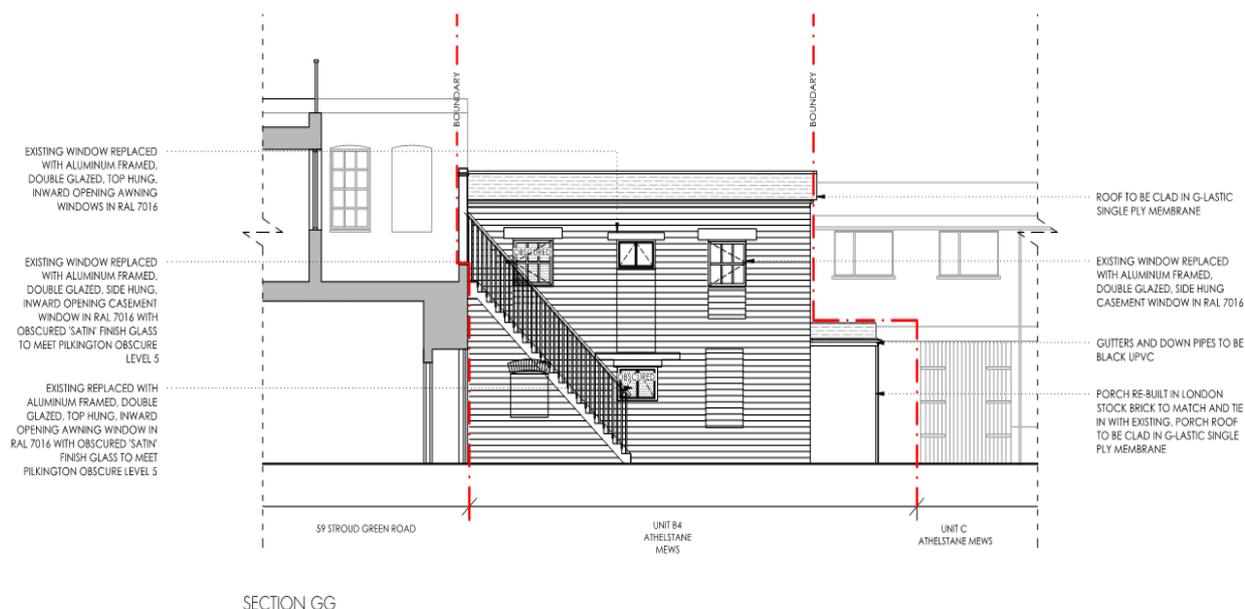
Elevation Facing Eastward onto Athelstane Mews/Stroud Green Road.
